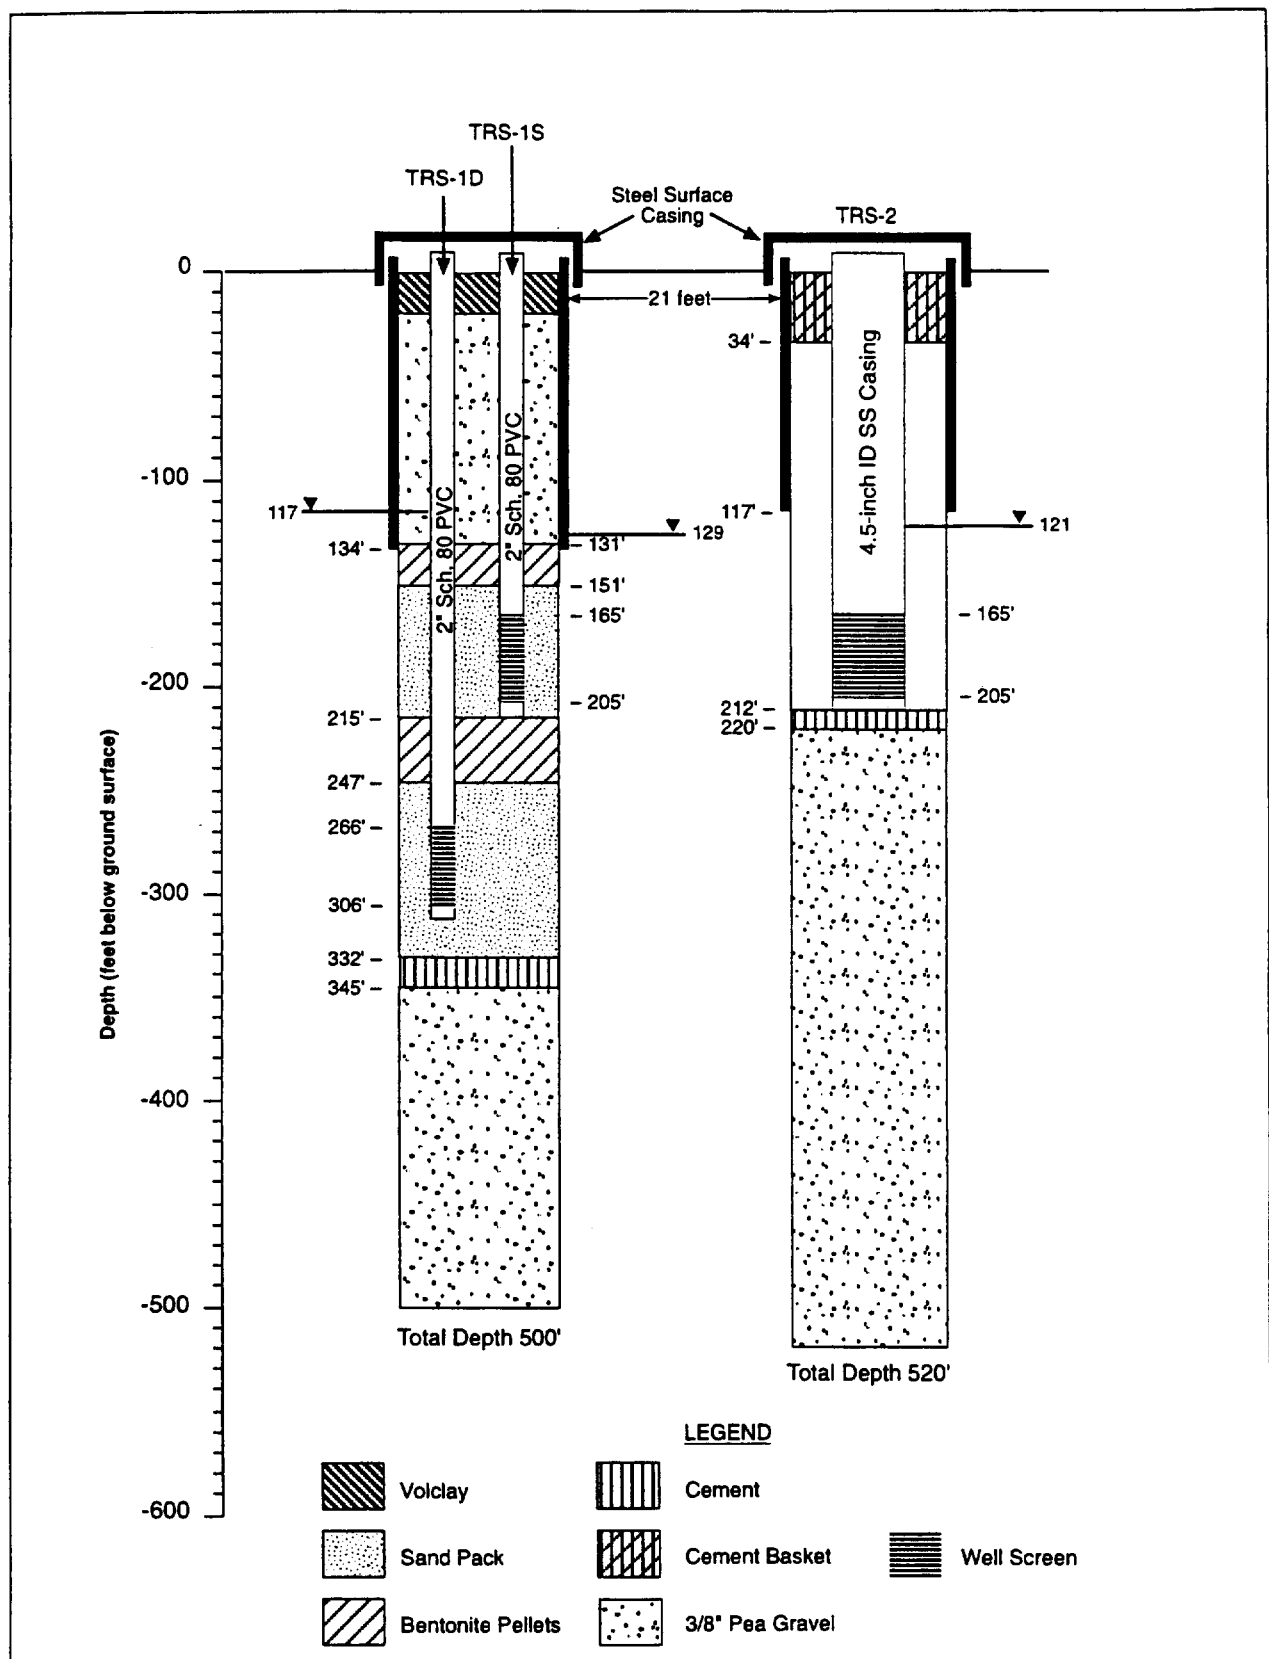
Well Completion Diagram for Target Road South Drill Site
